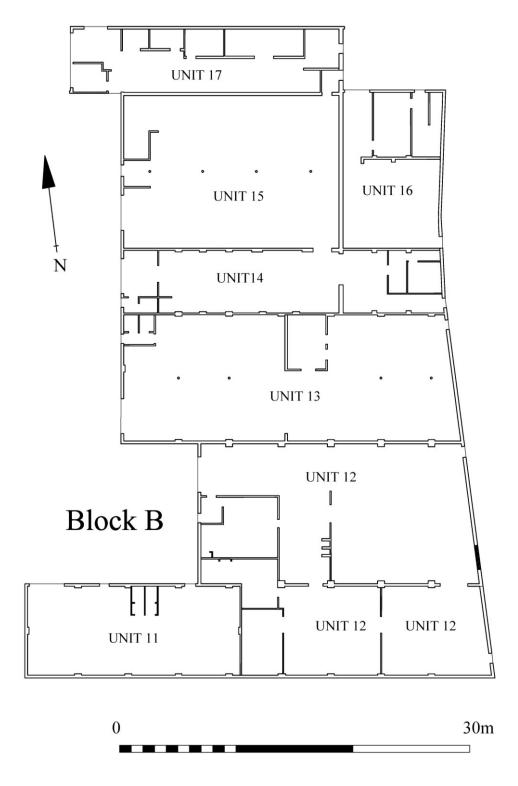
Block B floorplan Modified from Leicestershire County Council plans
